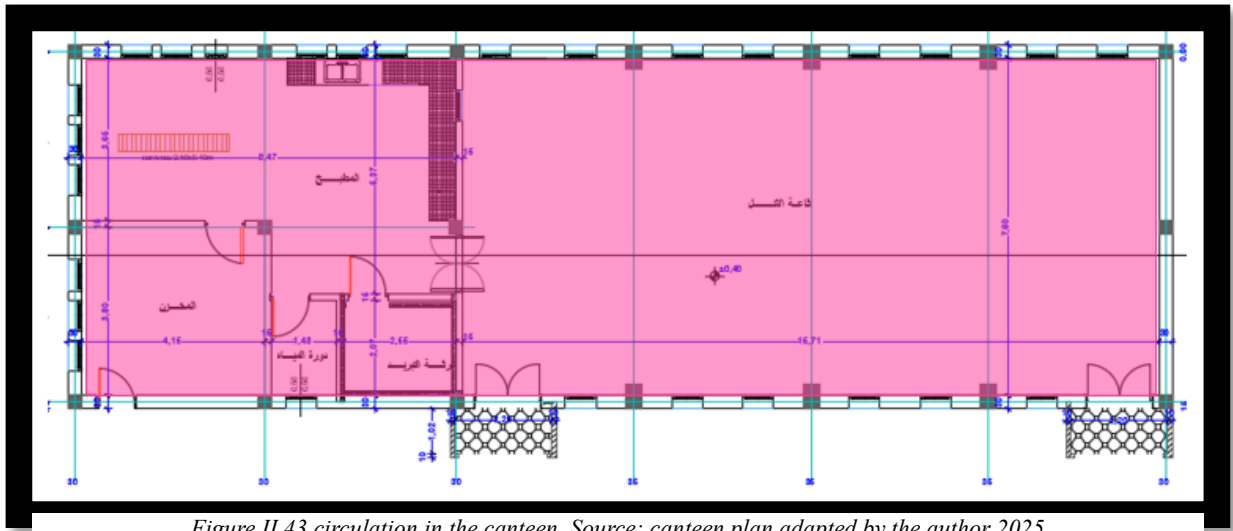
circulation in the canteen ,Source: canteen plan adapted by the author 2025
